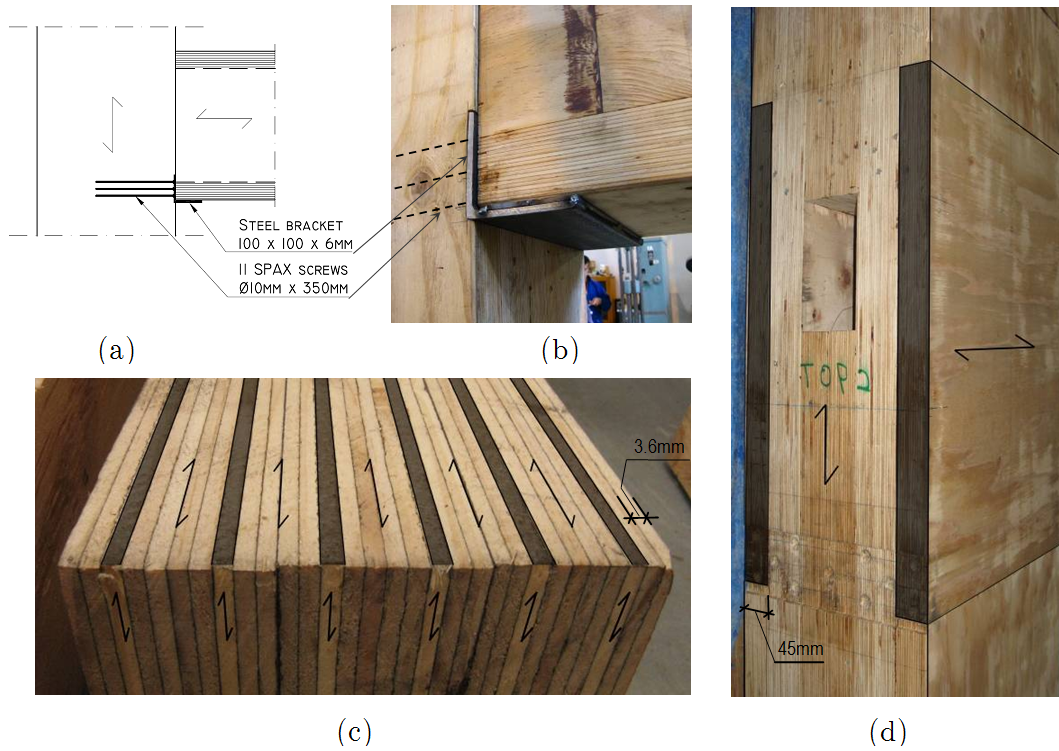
Column reinforcement, (a) side view of steel corbel with screw reinforcement, (b) steel corbel, (c) cross-banded LVL with cross layers marked in grey, (d) rotated outer layers of LVL marked in grey
